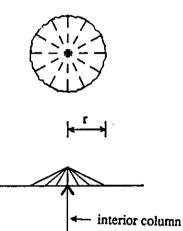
Alternative modes of collapse for a beam-supported slab
